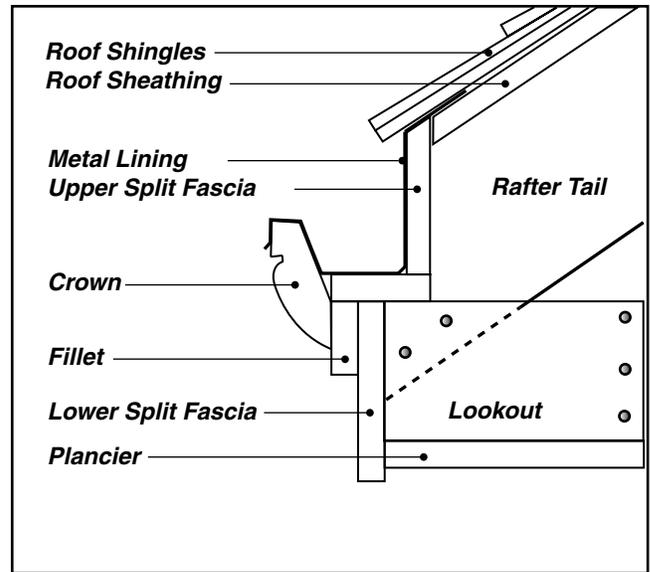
Section Through Metal Lined Gutter Greek Revival Period
